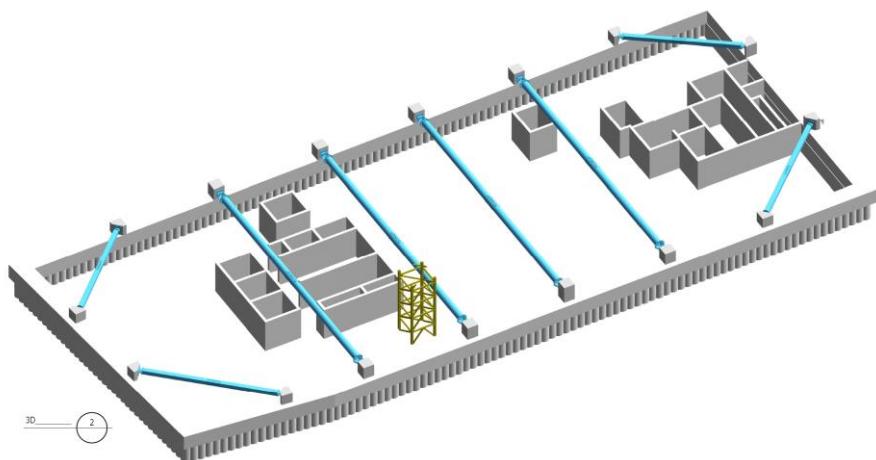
PROPPING LAYOUT - LEVEL 1
